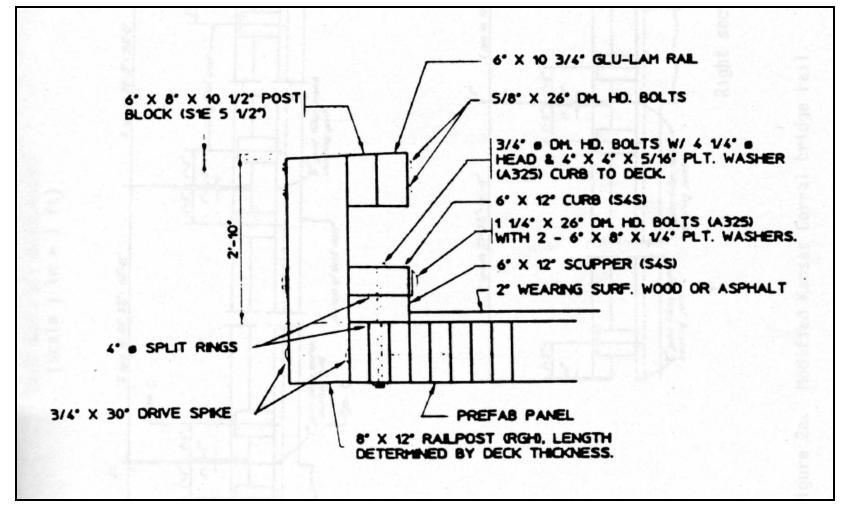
Cross Section of Forest Service Glulam Bridge Rail
